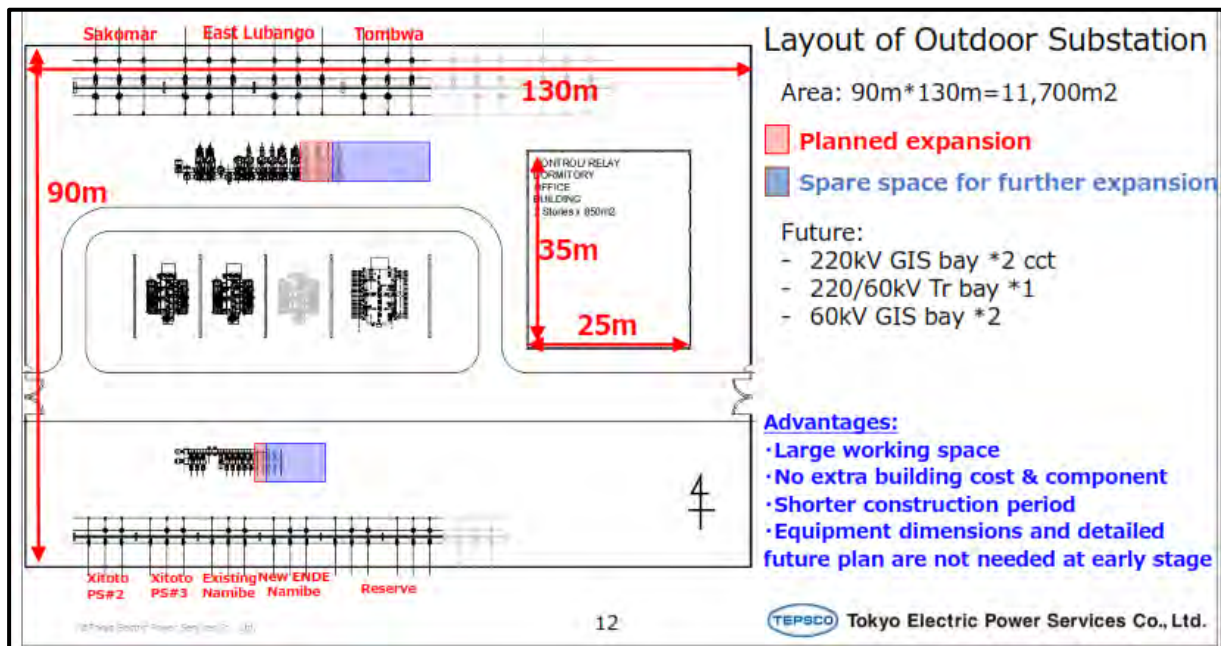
Location of planned substation in Moçâmedes (TEPSCO, 2020).
